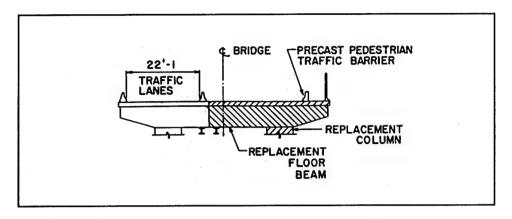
Traffic lanes on one-half the Fremont Street Bridge were kept open during construction (from Smyers 1984)
